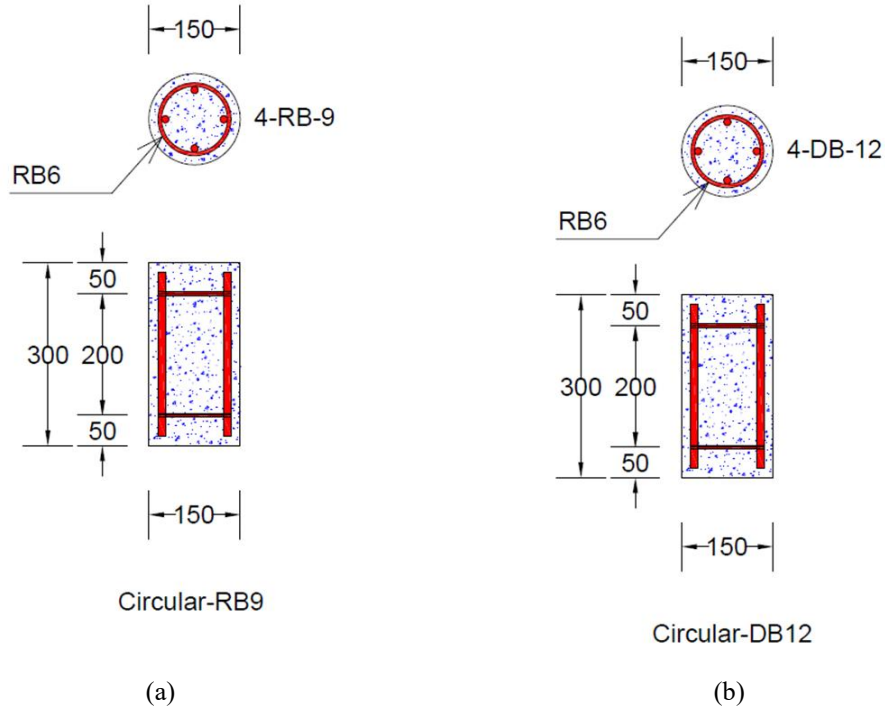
Geometrical and structural details of columns with (a) plain bars and (b) deformed bars. (All units in mm).
